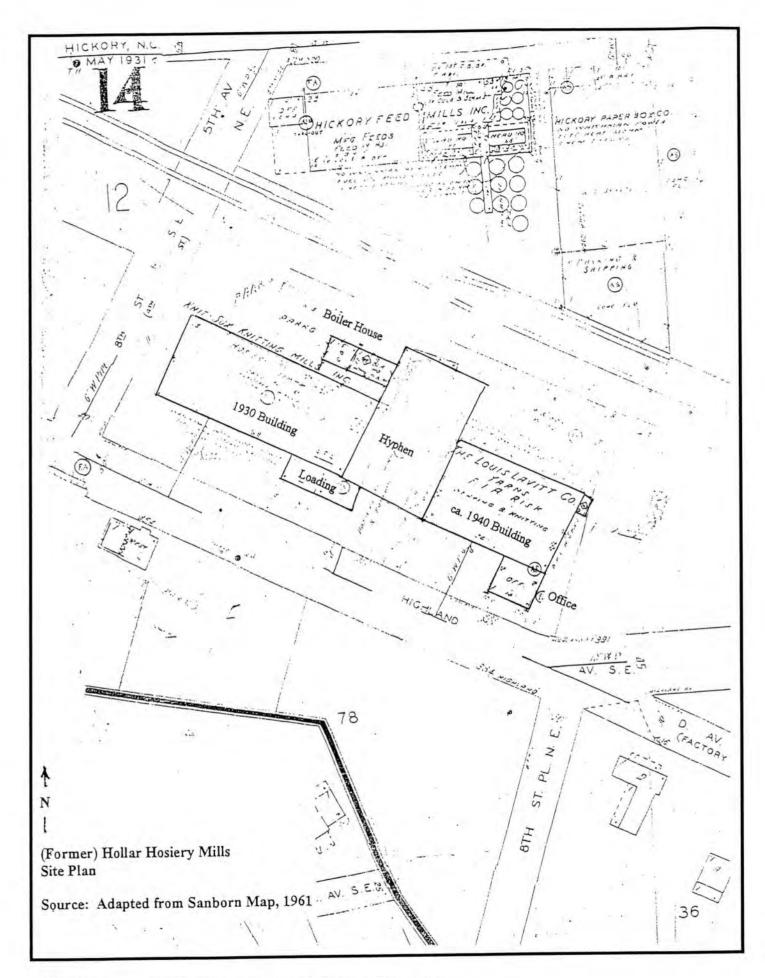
Hollar Hosiery Mills Building Site Plan. (Source: Part I-Historic Certification Application)
